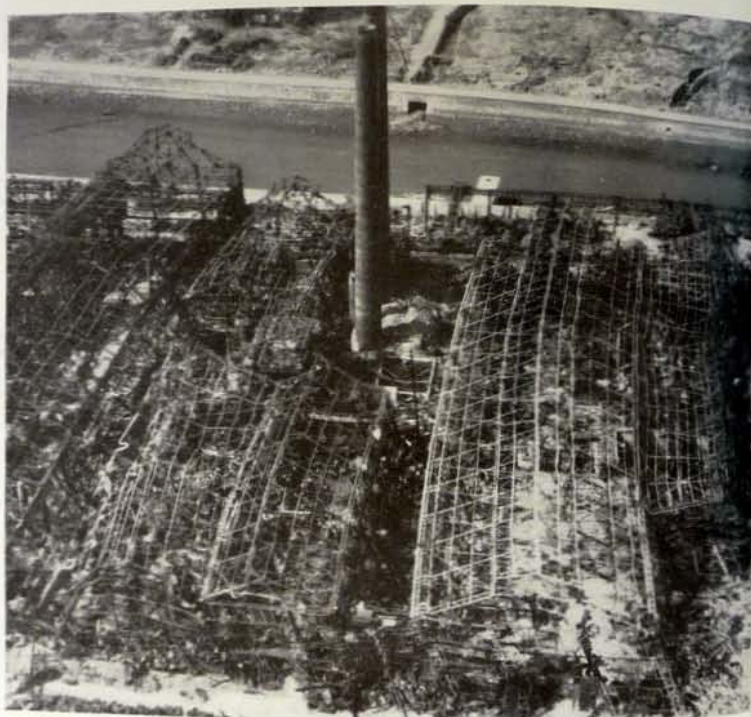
Group 26. Aerial view looking west. Buildings included in photo include Building 9 at right to Building 11 A at left.
